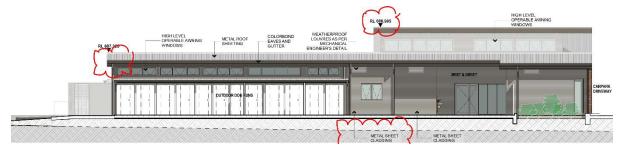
A: Animal Shelter building, NE Elevation – Solid light-weight partitions to outdoor dog enclosures – s.4.55 Modification (source: F&J Tepa)
